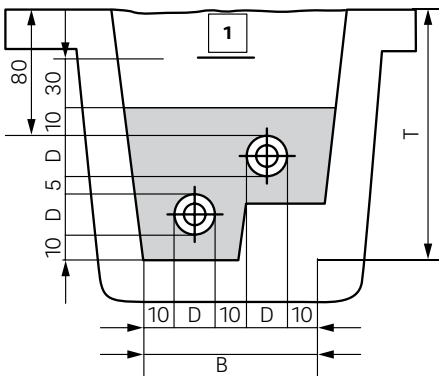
Trench width of stepped trench 2 pipes (UNO/DUO)
